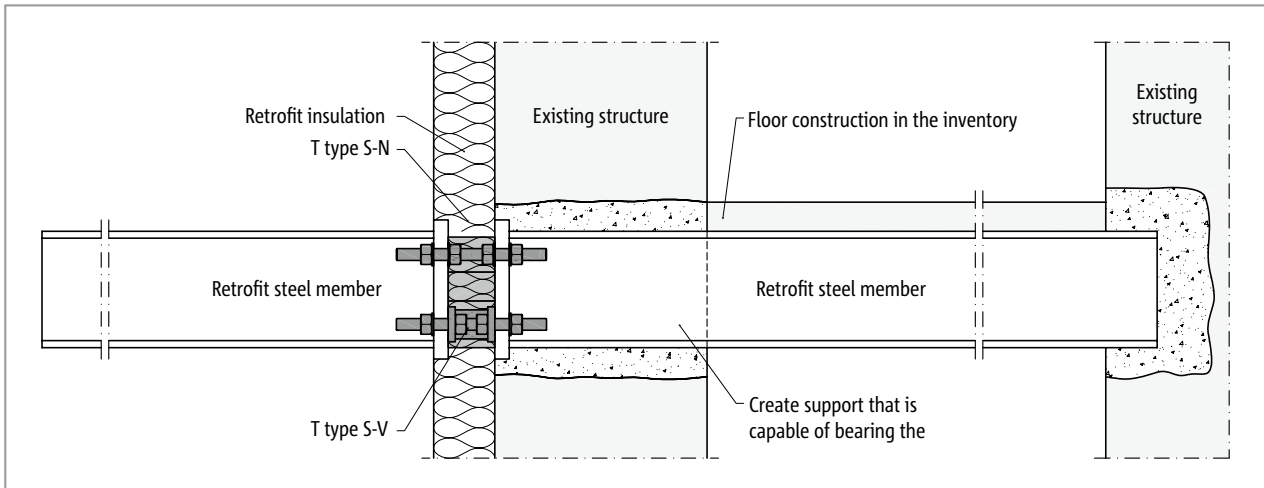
Schöck Isokorb® T type S-N and T type S-V: Retrofitted cantilevered steel balcony, connected to retrofitted steel beam
